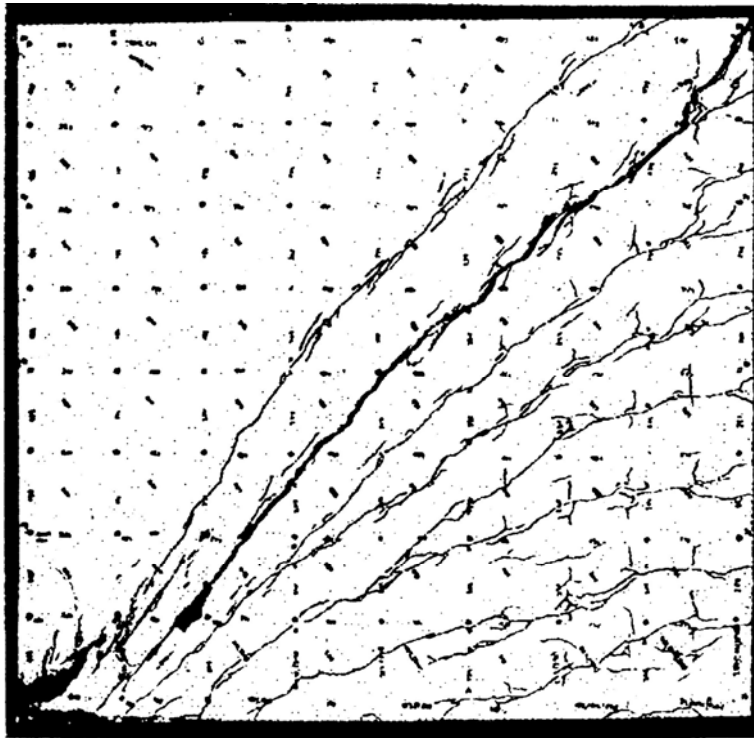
Cracking pattern for wall S9 tested by Maier and Thürlimann (1985) at diagonal tension failure
